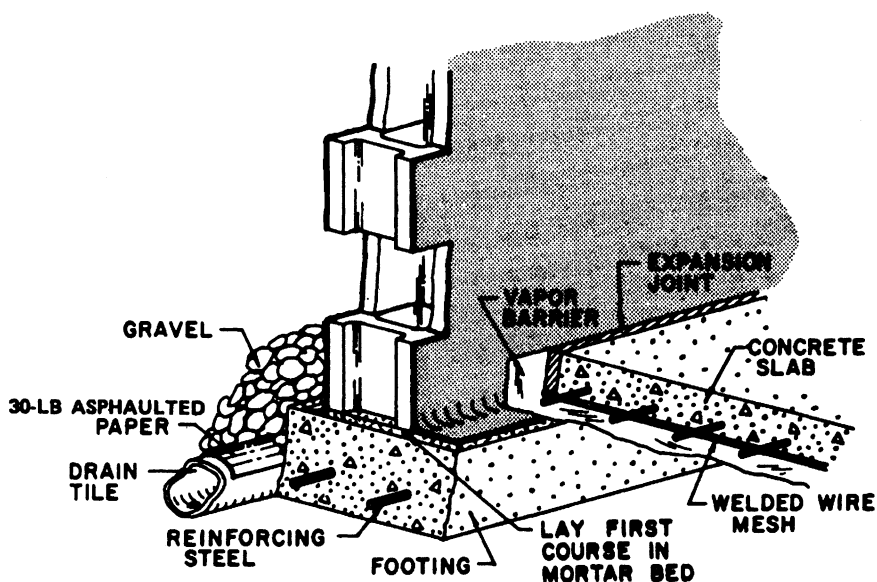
Footings should be twice as wide as the wall thickness. Install drain tile adjacent to the footing to prevent buildup of water pressure against foundation. Cover open drain tile joints with 30-pound asphalted roofing felt. Backfill over tile with 12 inches of coarse gravel.
